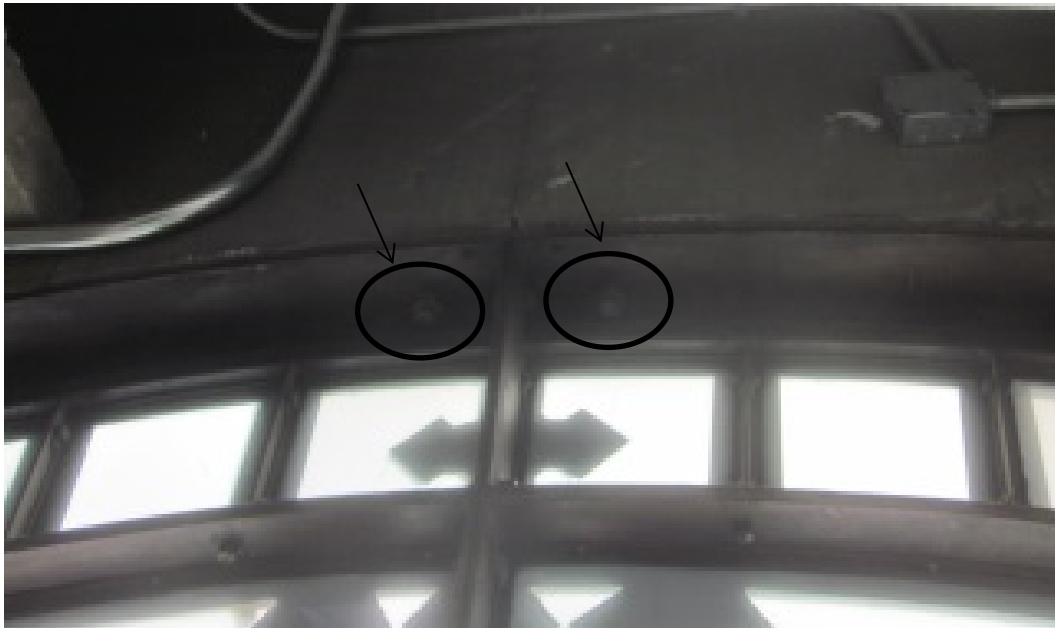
Connection from the clock face in the Peace Tower to the surrounding concrete wall
